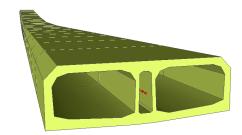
Model geometry: tunnel cross section applied to beam elements.
